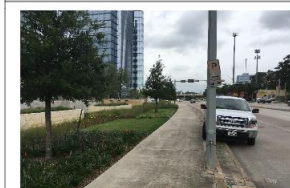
Sidewalk along Eldridge Parkway Southbound at Energy Center IV Facing North
